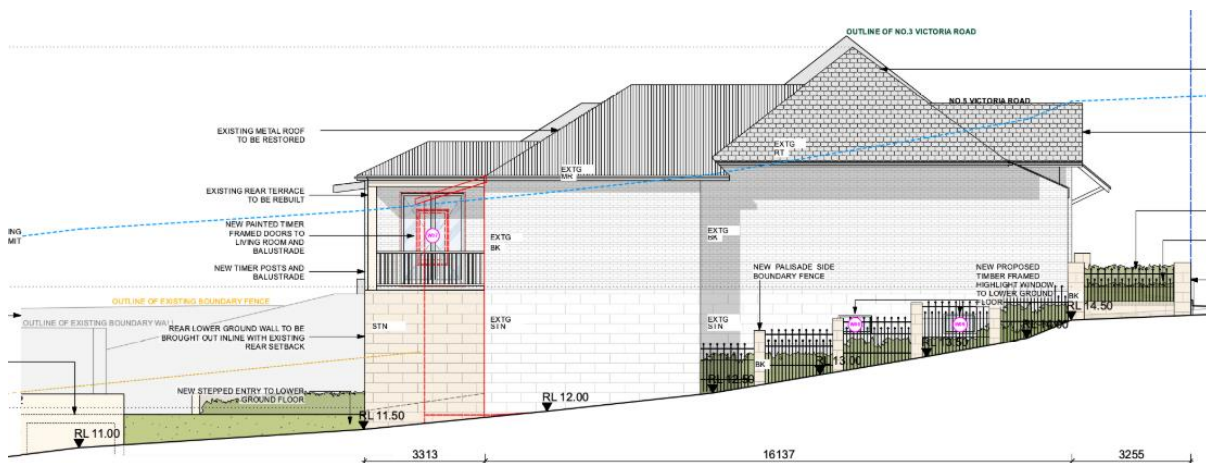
Proposed south-west (side) elevation – Dwelling 1 and Dwelling 3
